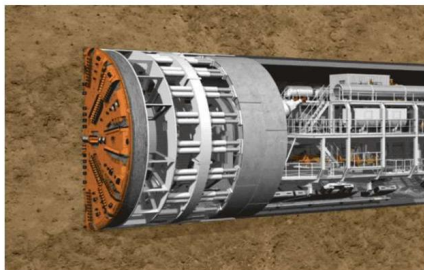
Tunnel Boring Machine (TBM) Tunneling
